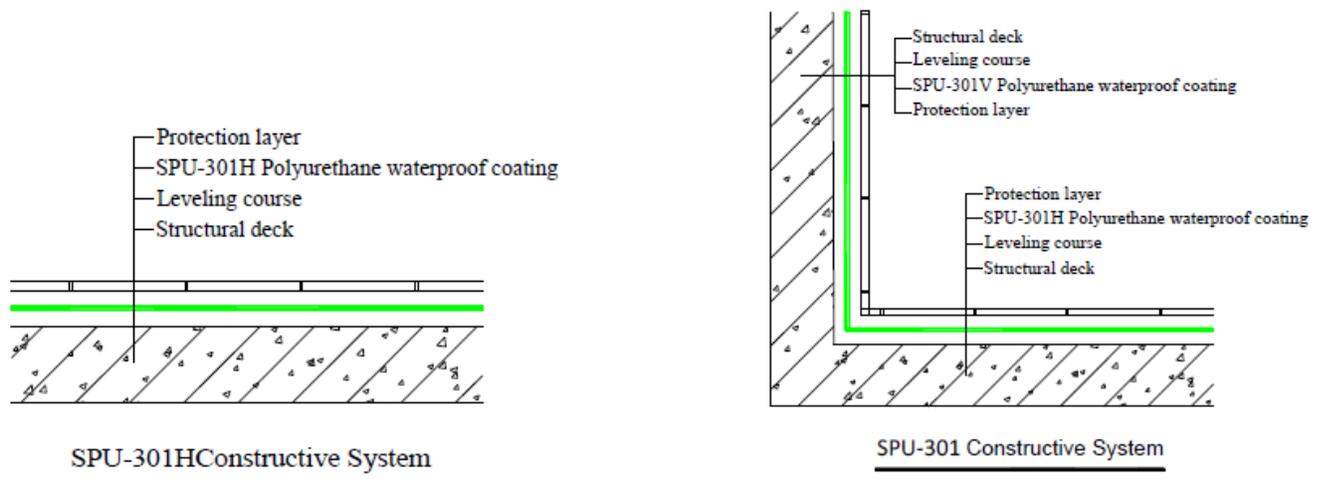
SPU 301 Waterproofing of wall& slab with working space<sup>[11]</sup>
